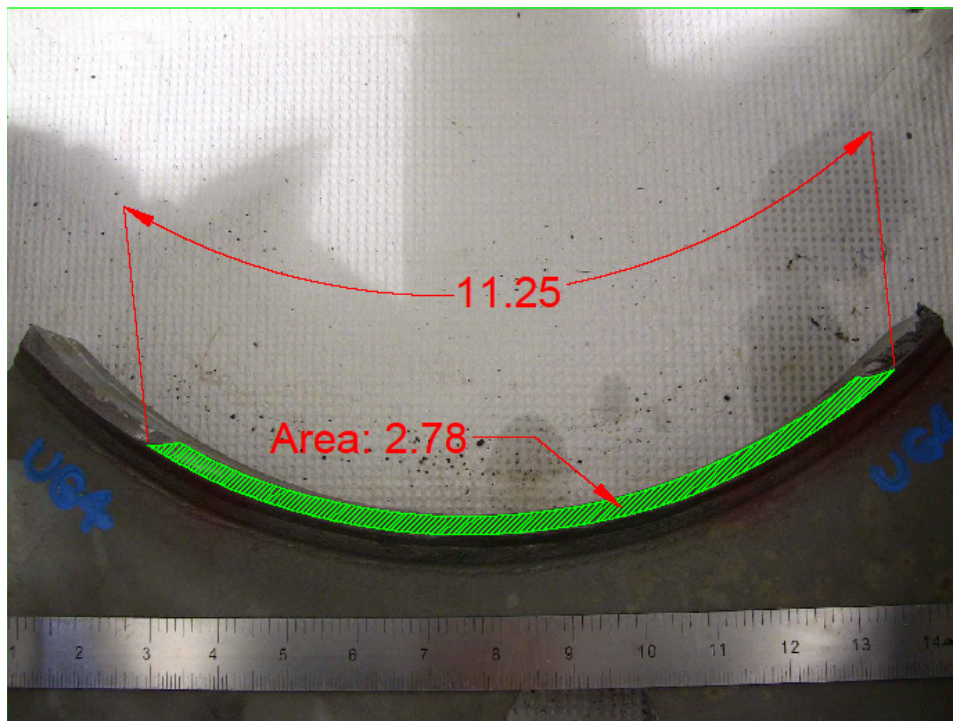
Photo. Specimen 1G4 fracture surface.
